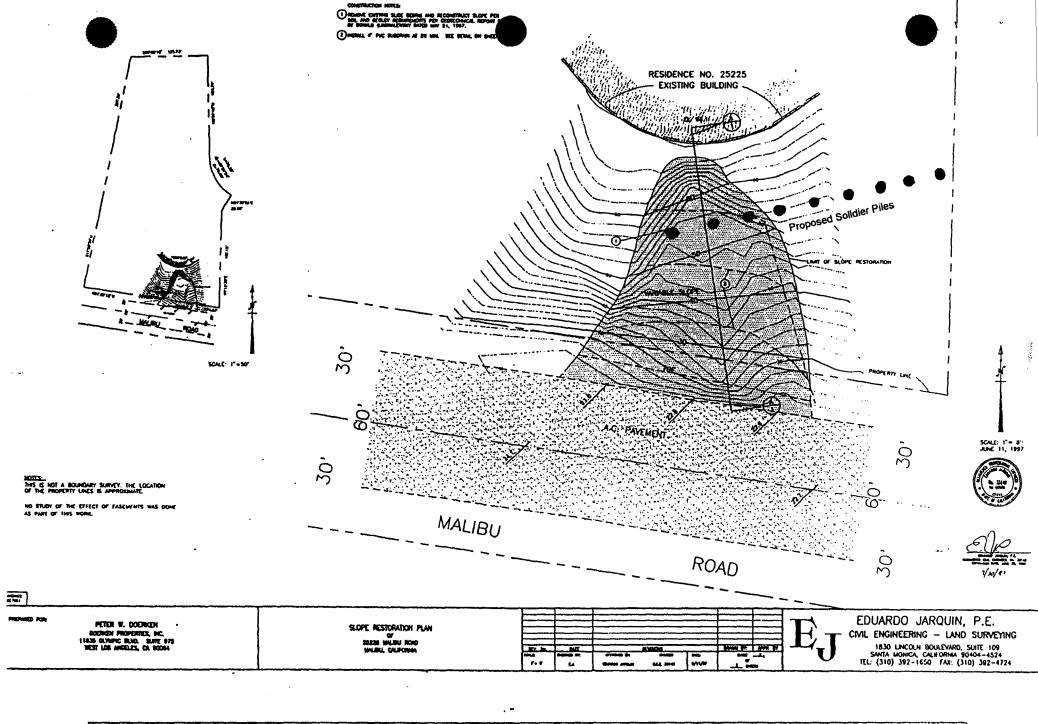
(4-97-154) Site Plan /Grading Plan
